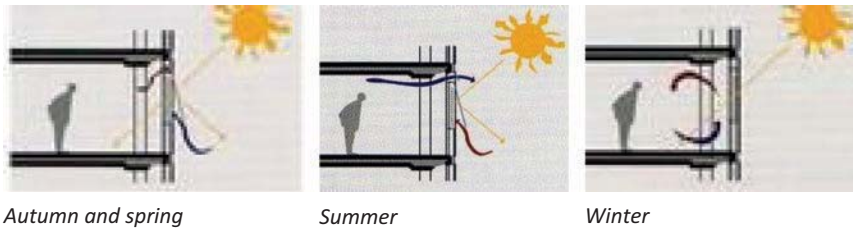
Ventilation of double-window façade at Klosterenga. Note: Drawings by GASA Architects
